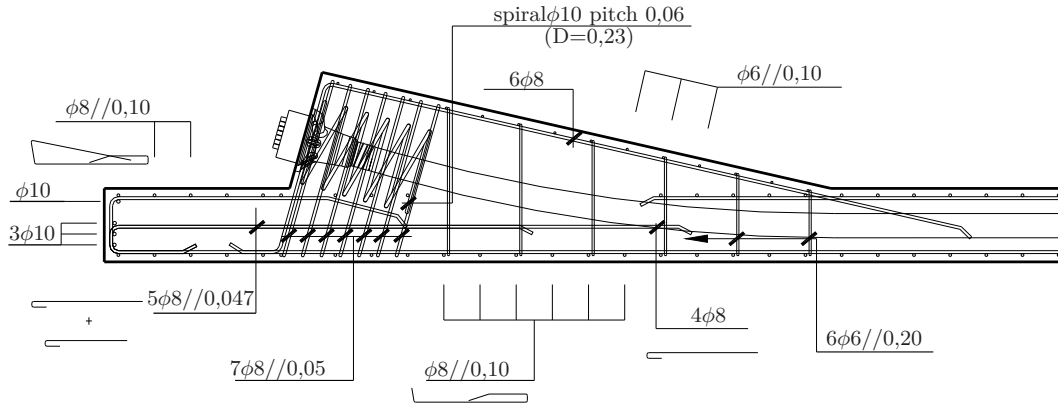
Reinforcement in the blister anchorage zone for tendon B
